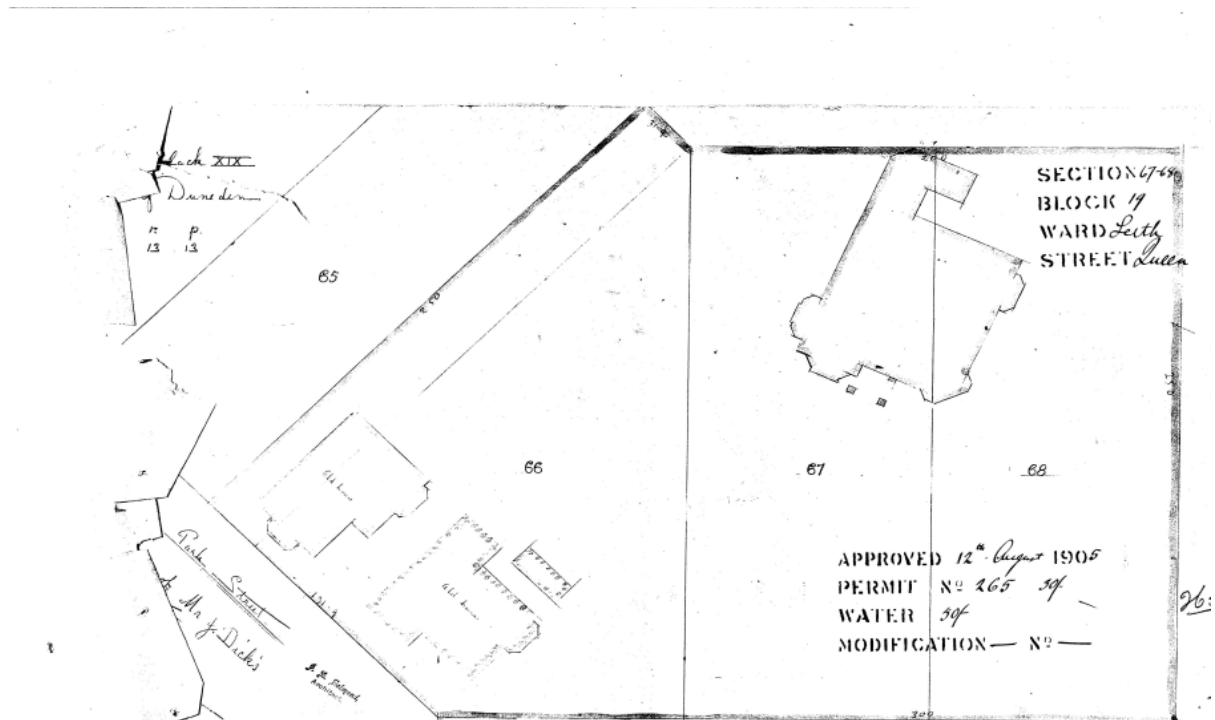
1905 site plan. Retrieved from record H-1905-1404 AAB19050091 0265 - Erect Dwelling, Plan (Dick) 12/08/1905.
